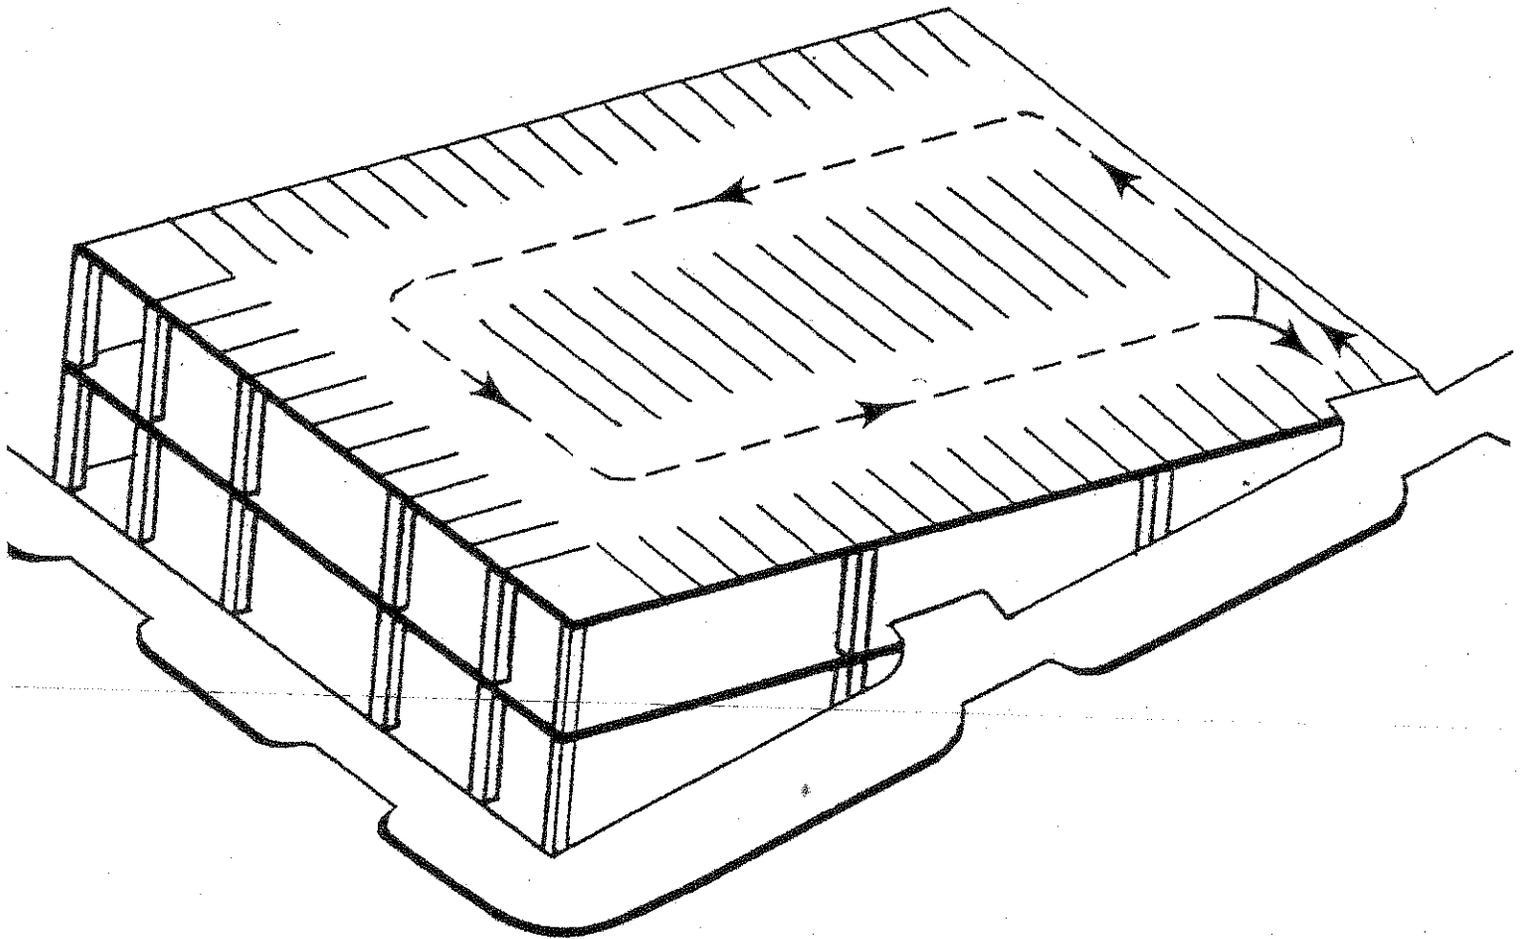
Proposed Parking Space Layout for the Main Street Lot
